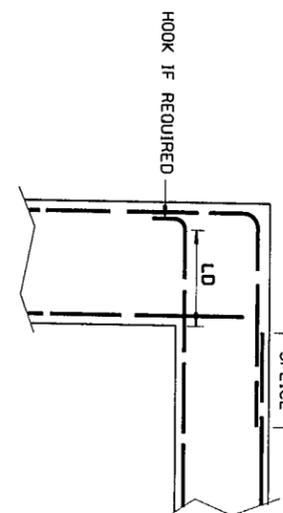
CORNER DETAIL (SLAB OR WALL)
